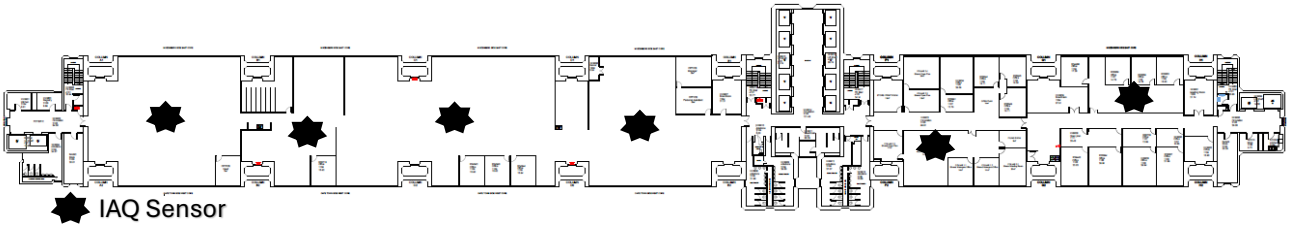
Tower Building proposed sensor positioning 9th floor (6)
